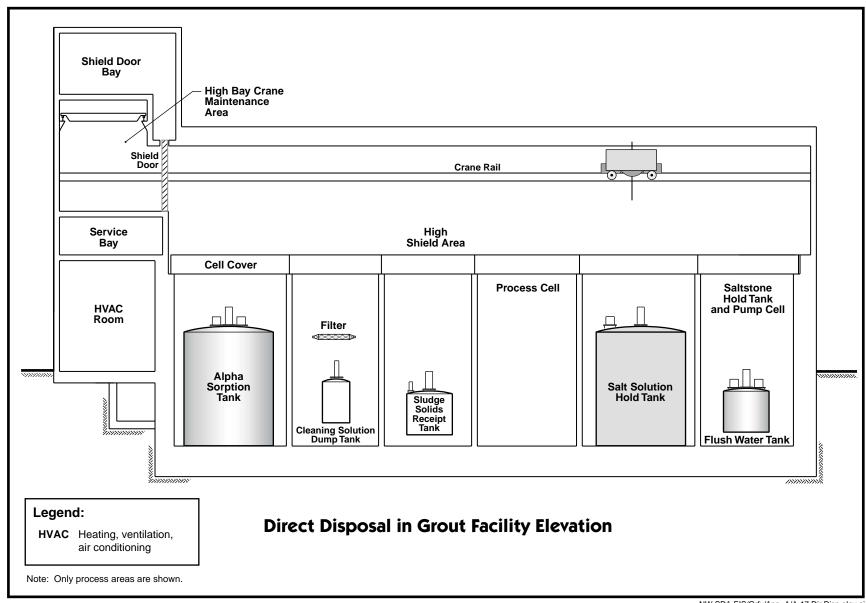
Elevation plan for Direct Disposal in Grout facility.
